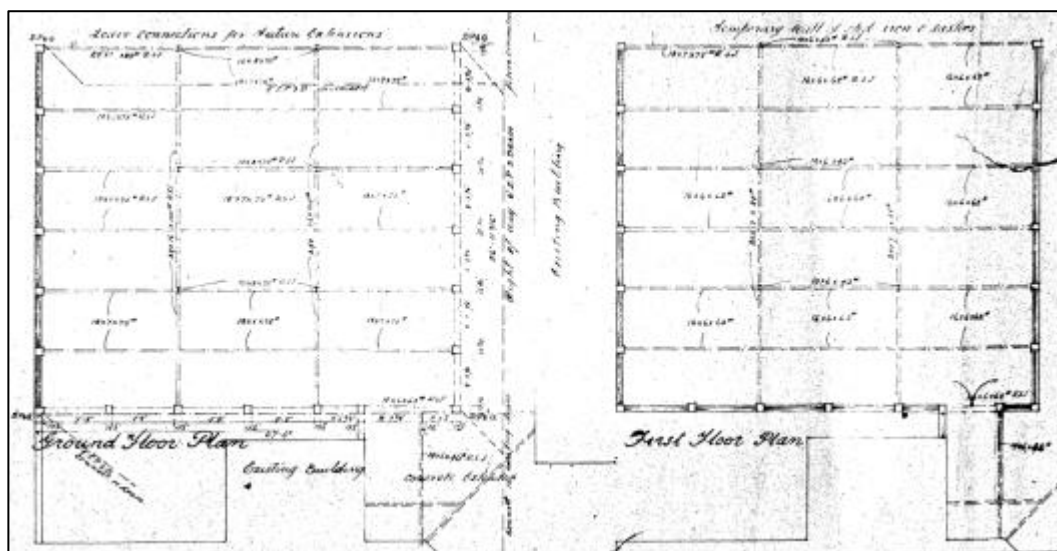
1924 plans showing the new factory to be built towards the rear of Sections 71 and 72
